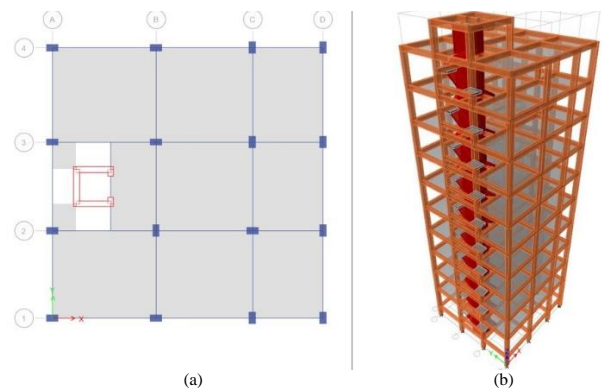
Illustration of the hospital building; (a) site plan perspective, (b) 3D view perspective
